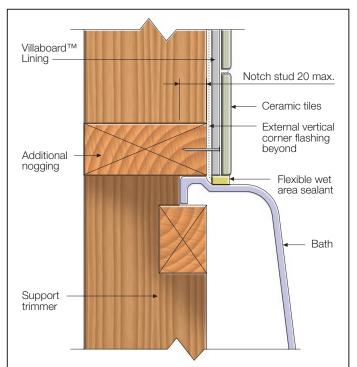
A BATH EDGE DETAIL - VILLABOARD™ LINING TO BE FINISHED WITH TILES - TIMBER FRAME
